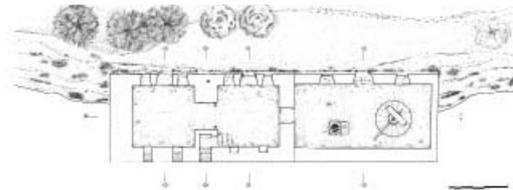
The "Askitario" Monastery Complex. Ground Floor Plan.
